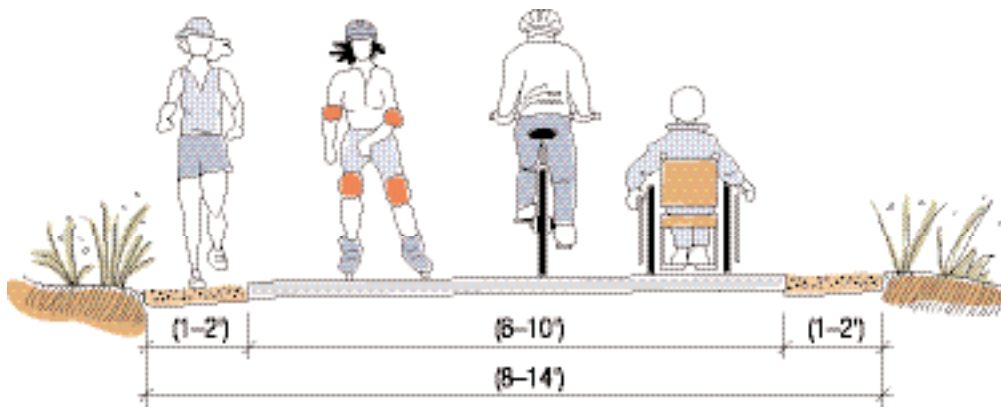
Multi-use trails can range from 6 to 10' wide, plus shoulder width for runners and other users.
